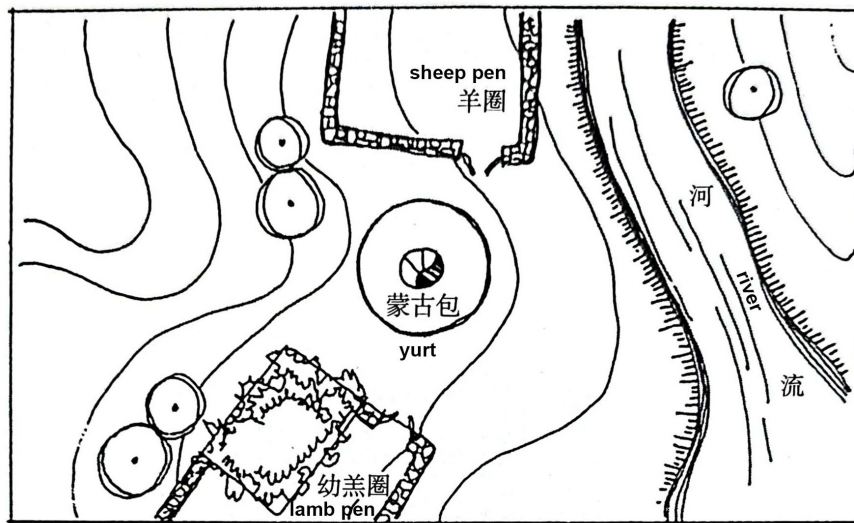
Site Plan.⁶⁹ Translated by author.
